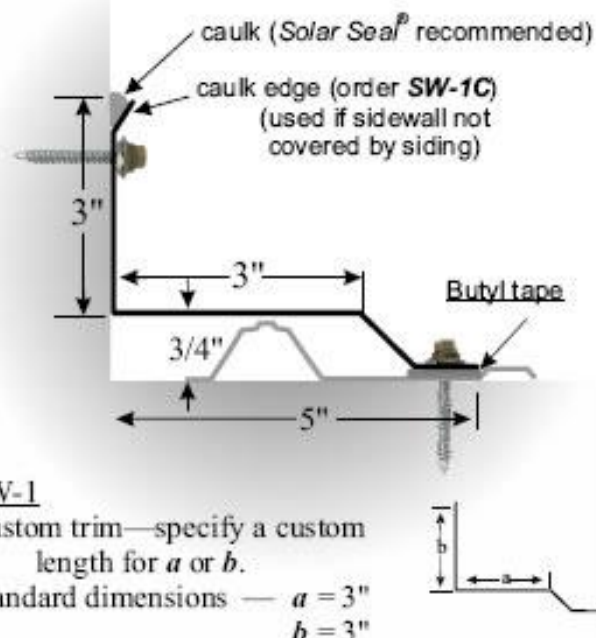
Sidewall flashing is applied when the side of the roof butts up against an adjacent wall. The wall-side of the flashing can either be covered over with siding or sealed with caulk (order SW-1C). Butyl tape should be applied where the "foot" of the flashing attaches to the roof.
